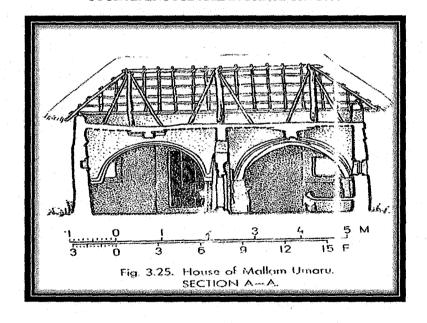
A SECTION SHOWING THE INTERNAL SPACE AND ROOF CONSTRUCTION SOURCE: ENCYCLOPEDIA BRITANICA 2000
